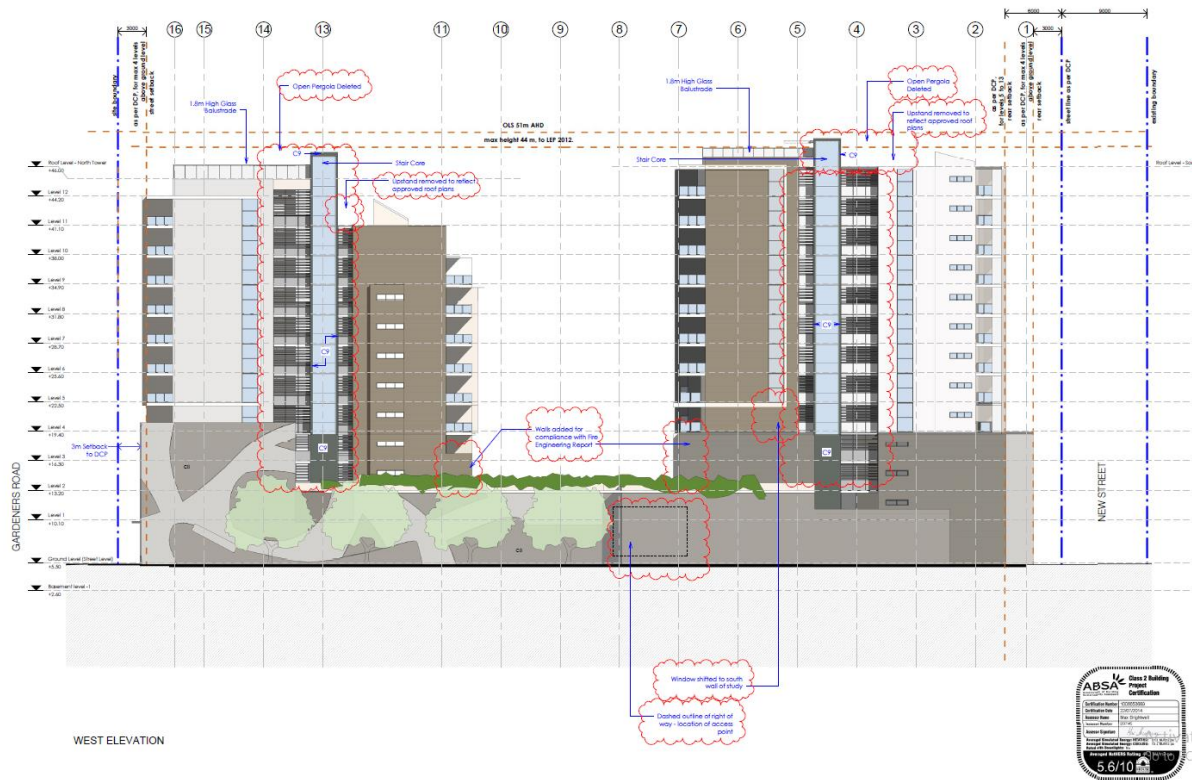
Western Elevation showing the changes proposed to façade to reflect the approved plans
